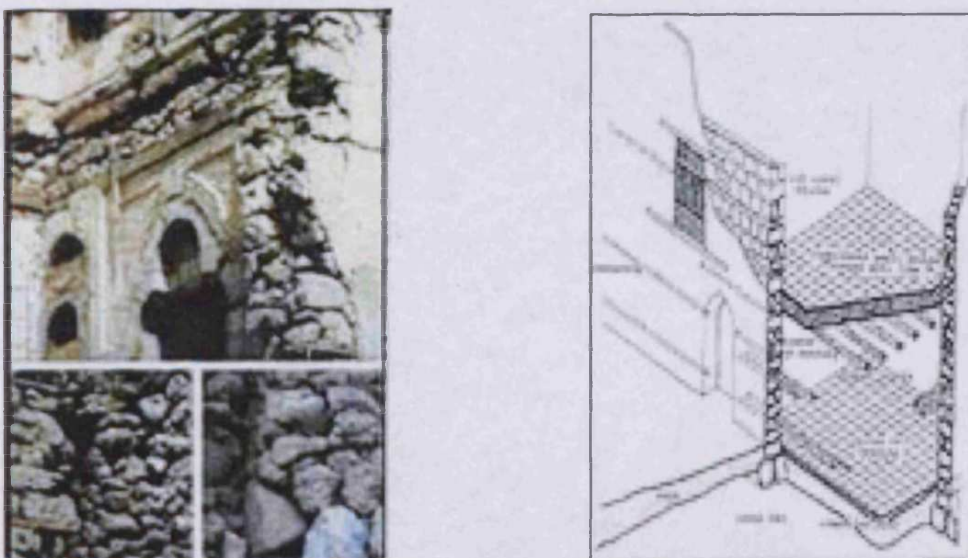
Construction of the Coral wall in Jeddah. Source: Eunice M. Lin ⁽⁴⁻²²⁾.
